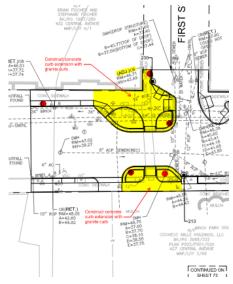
Potential Pedestrian Bump Outs under design for First St and Central Ave.
